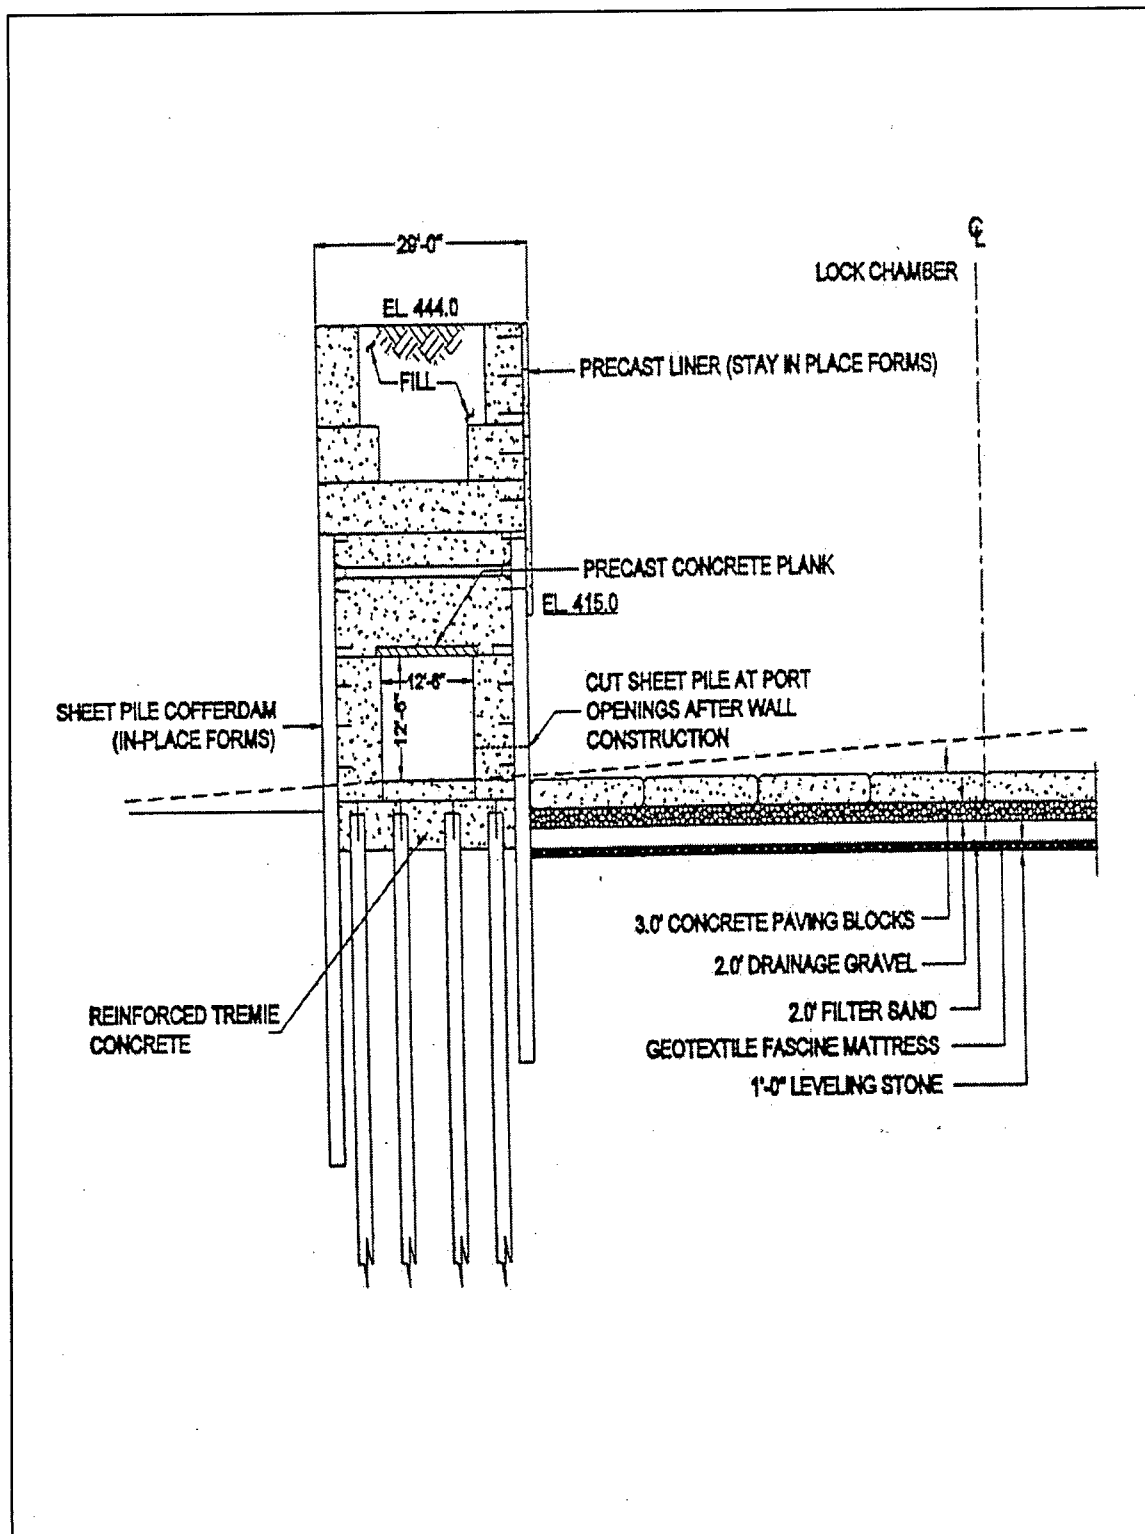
Plan 3, section through paving block lock floor, with bedding layers
